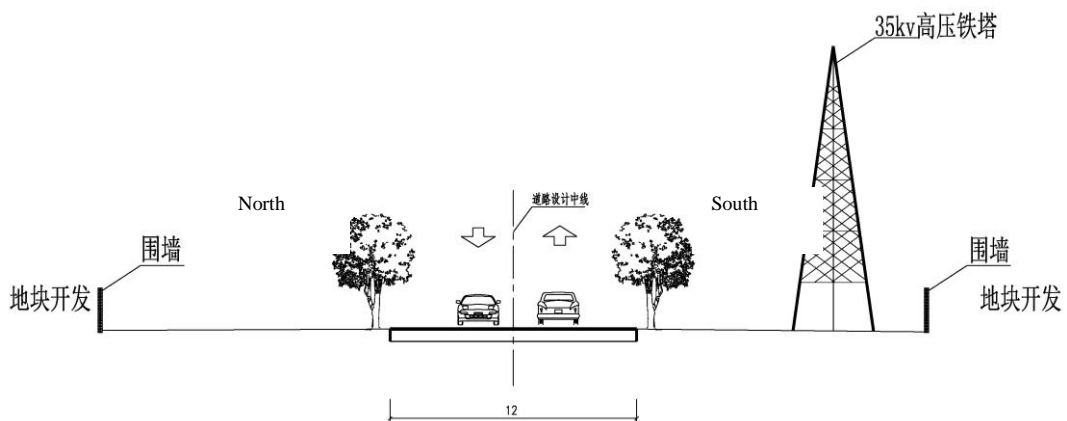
Existing Section of Yinxing Avenue (Handan Railway ~ New 316)
